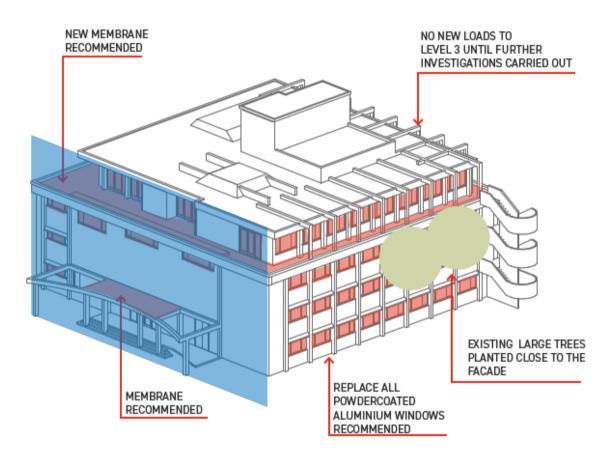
3D model indicating the aluminium windows proposed to be replaced. The northern windows and façade (blue) have been assessed in another Section (Section 7.1.2). Source: Lahznimmo + Antelope with Curio additions, 2021
